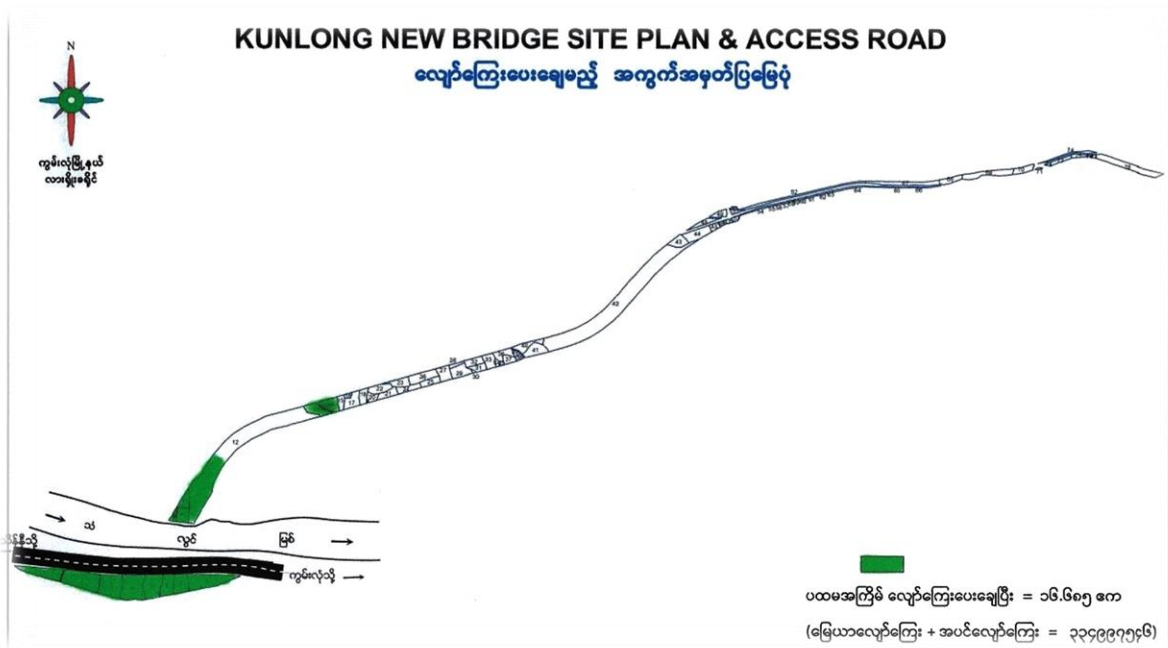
Location Map for land acquisitions of Kunlong new bridge site and access road
